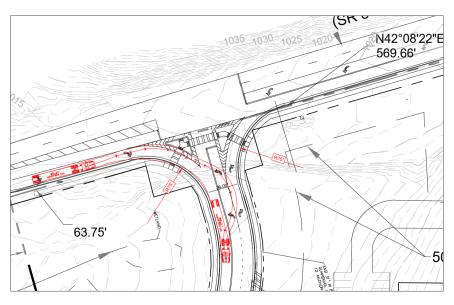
Winder Highway (SR 8/US 29) at Stanley Road – Eastbound Right (Entering Truck)
